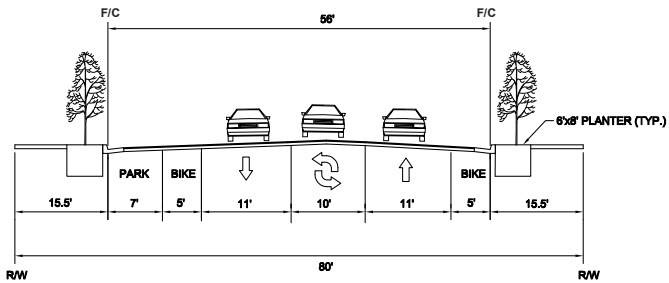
6th Street UPRR to Railyards Blvd. (looking north)
